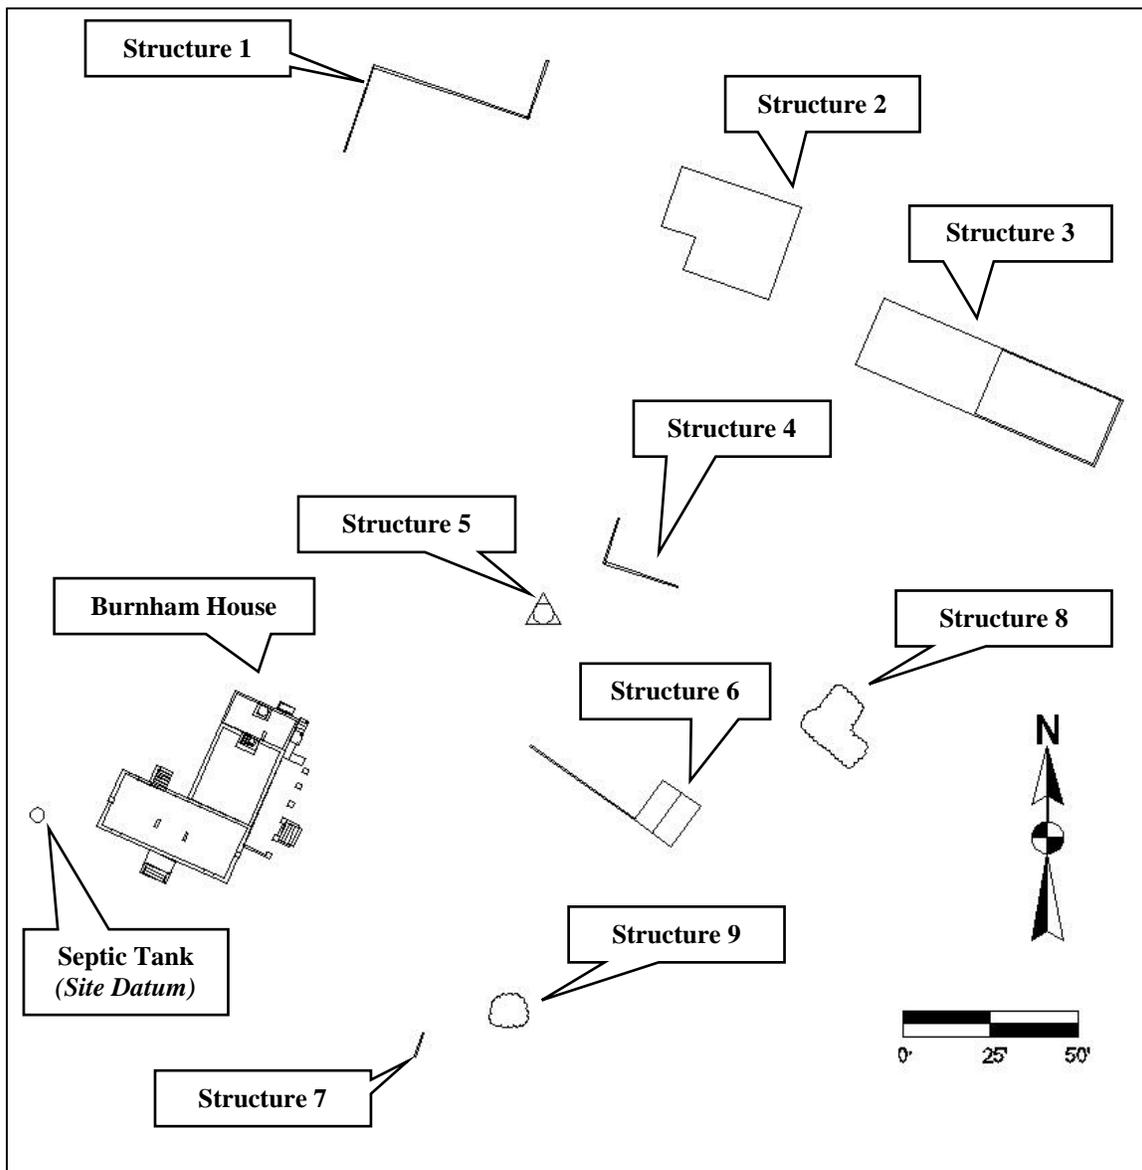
Burnham House Site (7NC-F-157) Plan Map.
